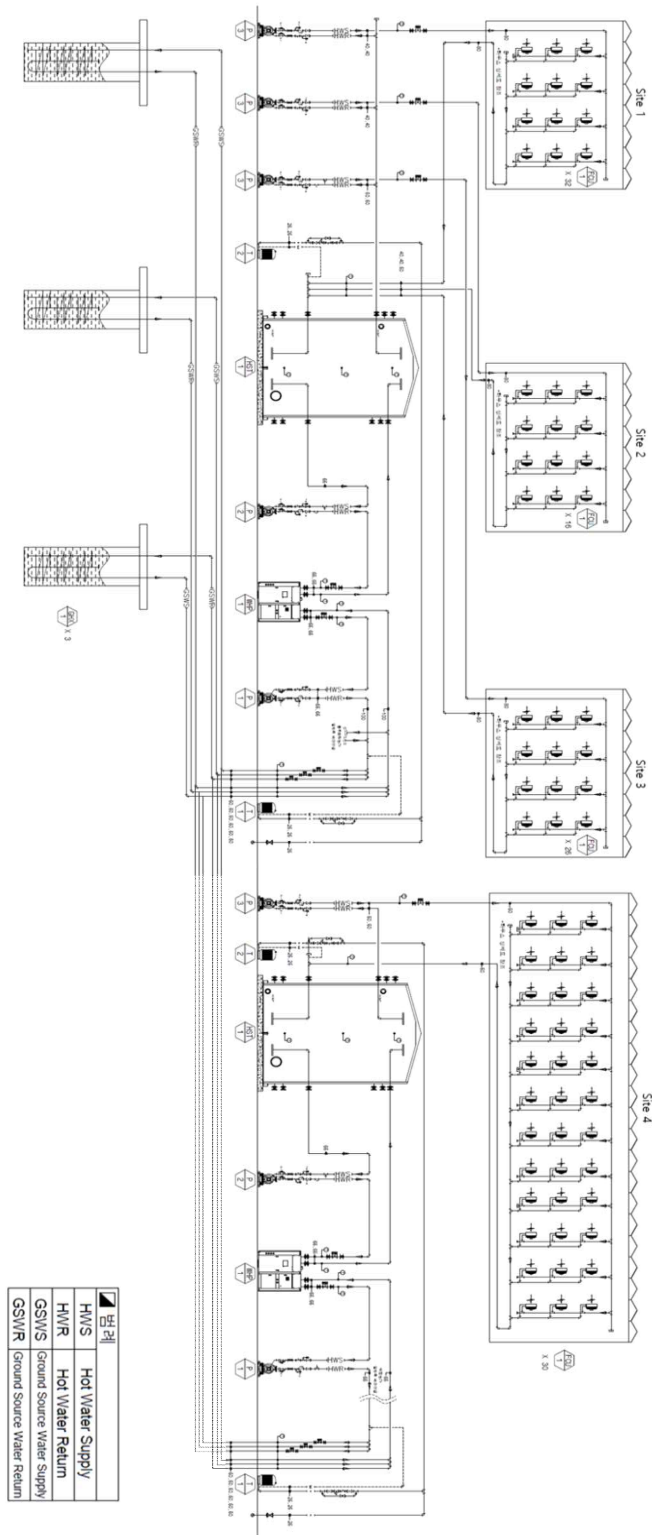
A complete block diagram of the underground geothermal heat pump system
